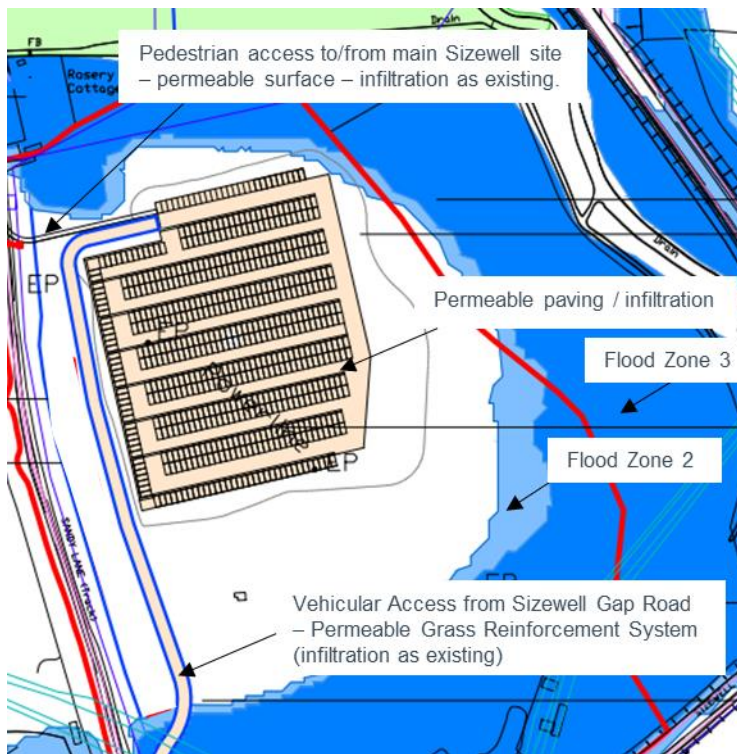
Pillbox Field Outage Car Park Surface Water Drainage Strategy Schematic
